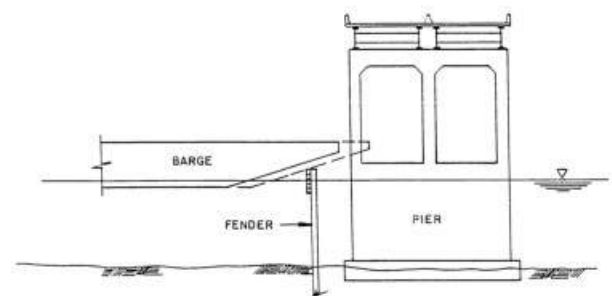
Elevation of Barge Bow Impacting Pier
